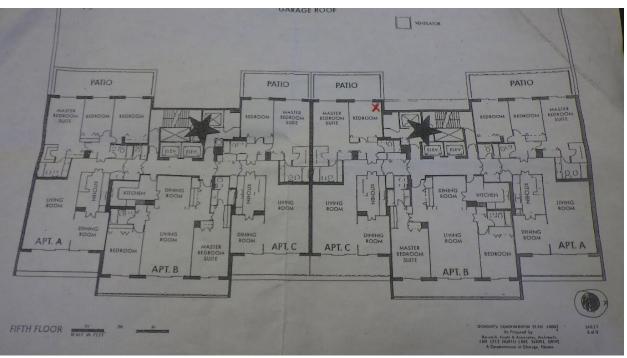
Apartment floor plan with a red "x" by a patio door showing where the fire initiated.
